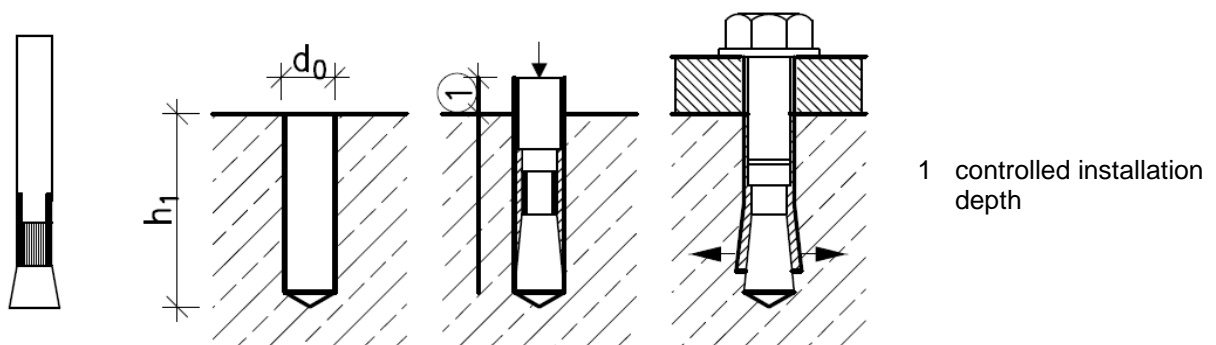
Sleeve-down type fastener; drilling with stop drill
